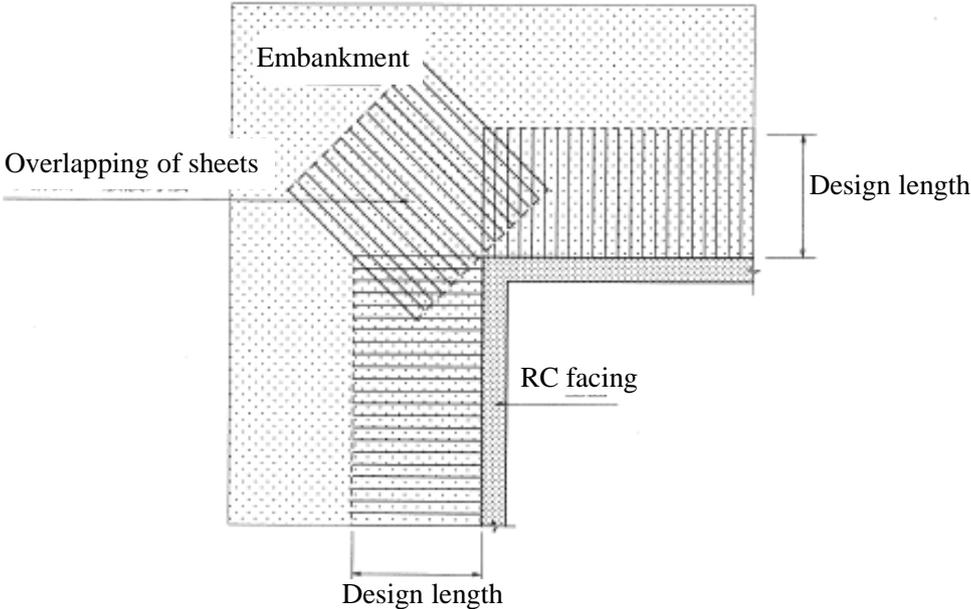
Arrangement of geotextile sheets at an inward-bent corner
